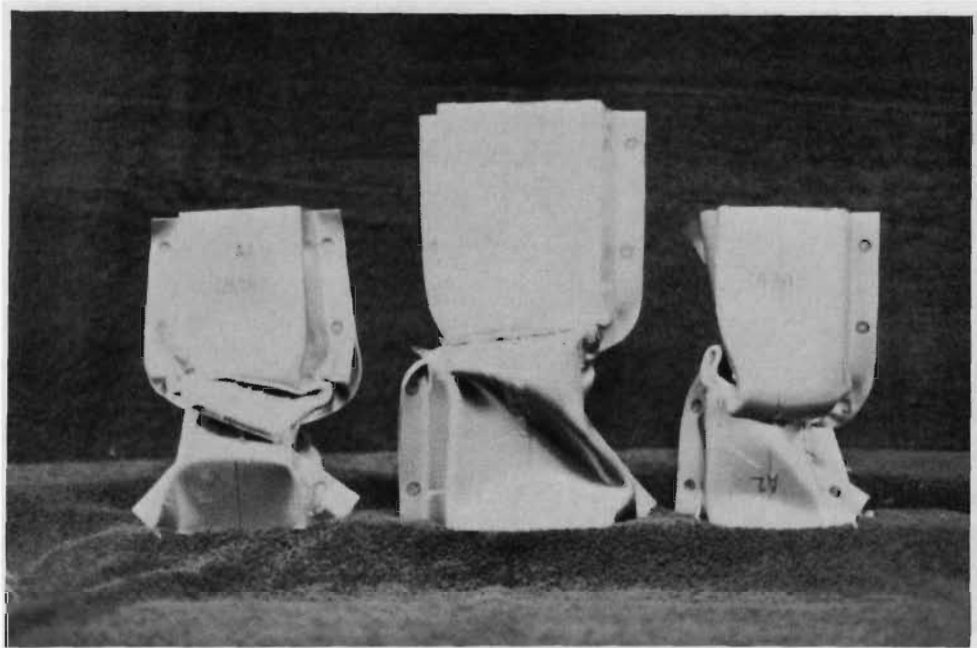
Typical Twisting Type of Stub Column Specimens
